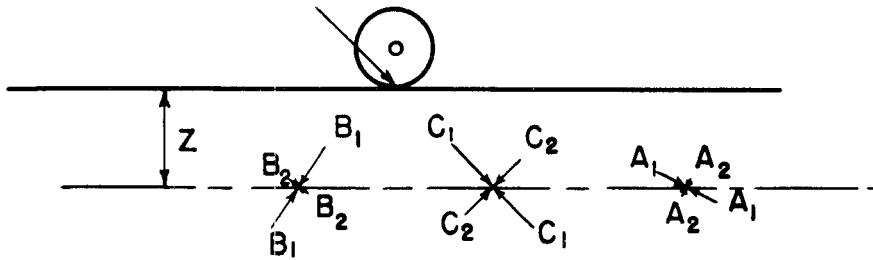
Principal stresses acting at three points in a horizontal plane under a wheel load.
